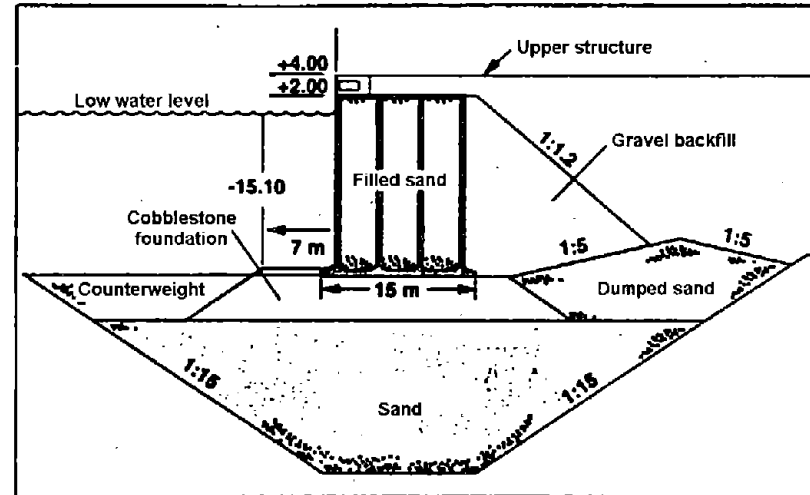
Typical cross section of a quay wall, foundation construction and backfill.
